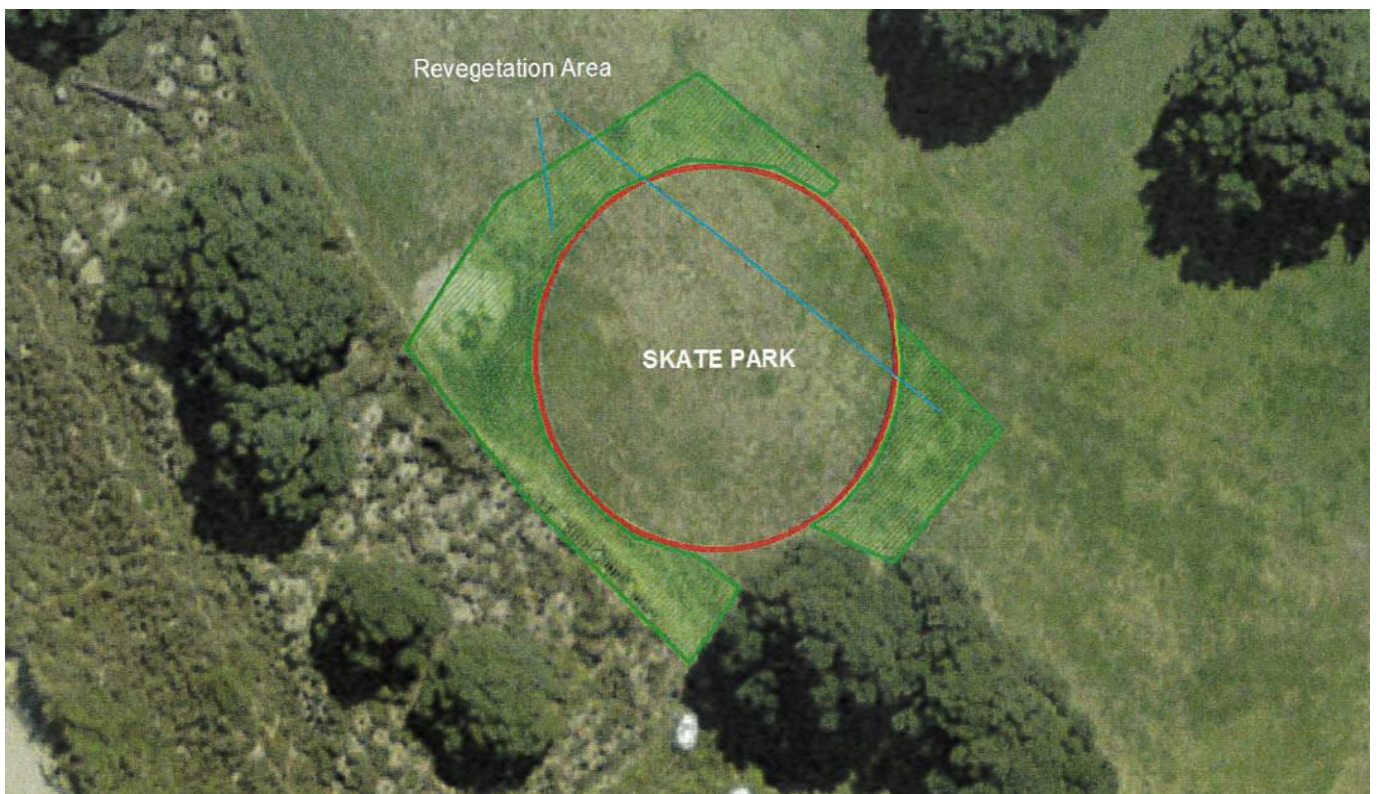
Applicant's submitted revegetation and landscape plan for the Skate Park proposal
